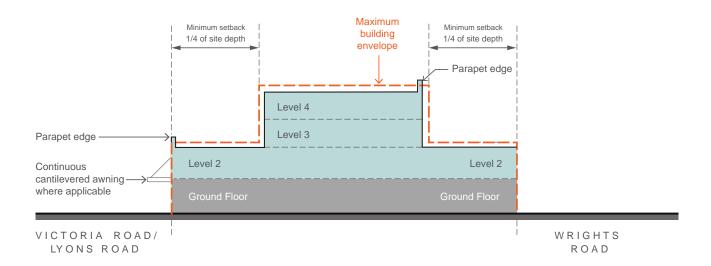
Victoria Road Drummoyne Area G - Maximum Building Envelope Section
